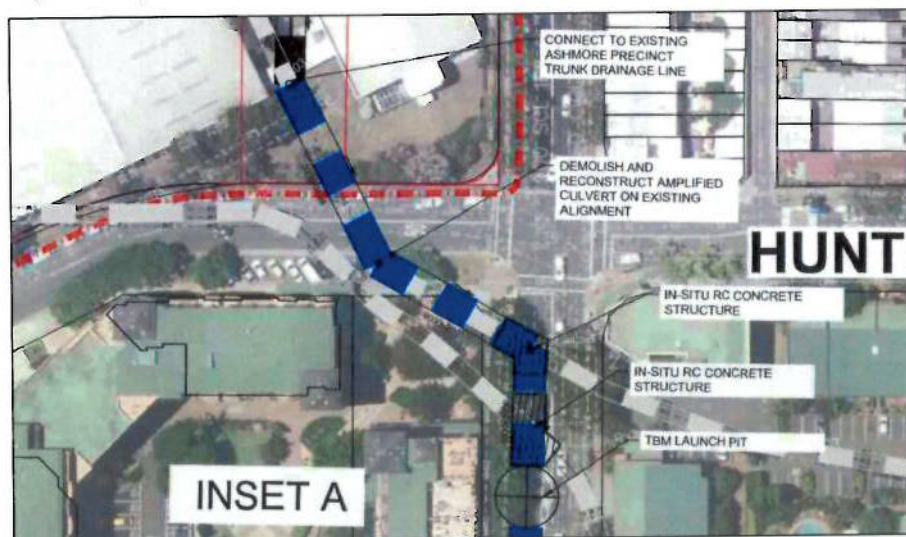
Upstream connection detail requires a detailed hydraulic assessment
